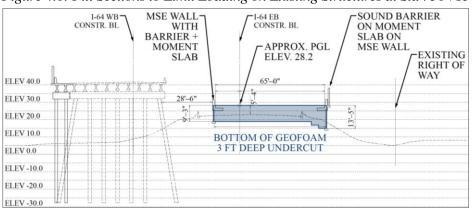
Fill Sections to Limit Loading on Existing Structures at Sta 736+15
